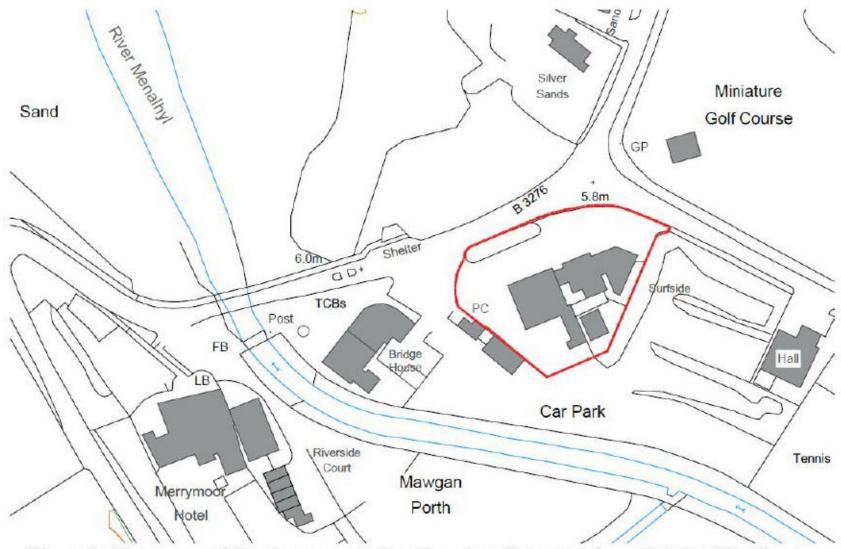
The proposed development site location plan. Extracted from Existing Site Plan by SUPERSTRUKT, Job no: MP-PL-2020, Drawing no: PL-01, Rev: REV, 17th May 2020
